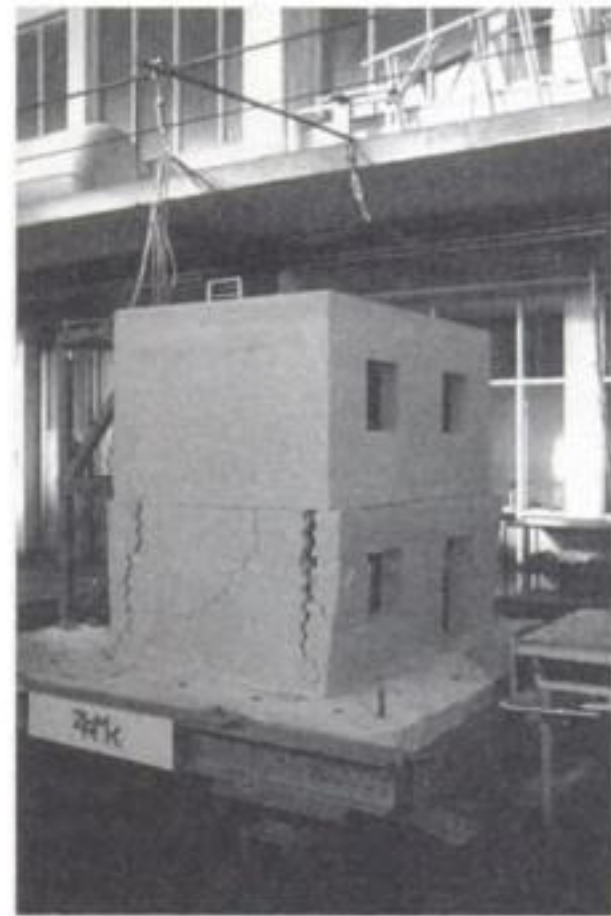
Sliding of the slab and pushing out of walls during brick-masonry house models with r.c. slabs shaking table test.
